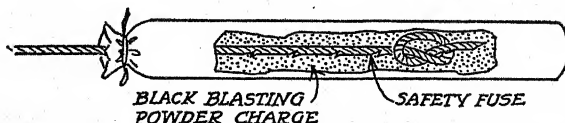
The recommended method of making up a primer with black blasting powder and safety fuse
